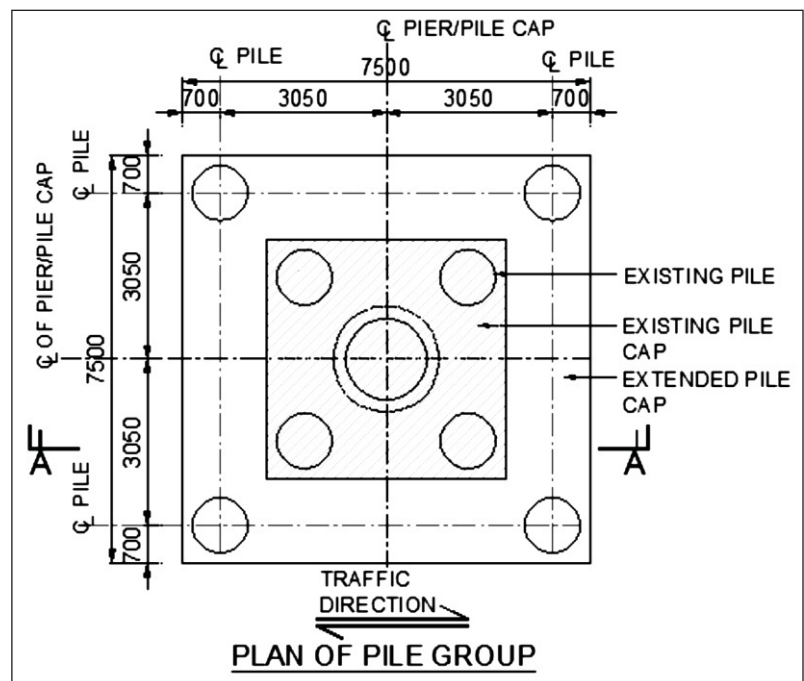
Plan of rehabilitated Foundation showing existing/new piles
